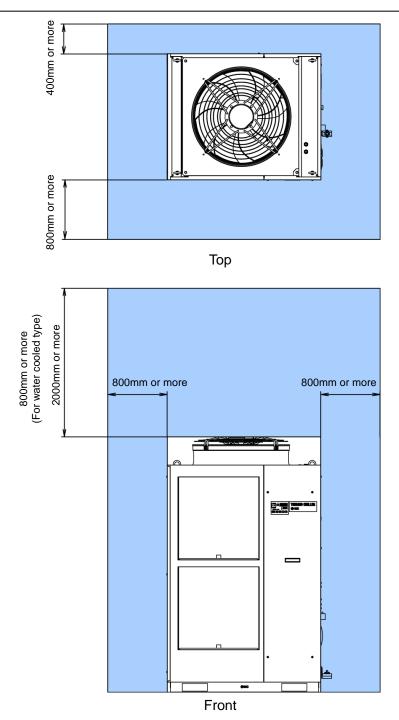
Installation space (This drawing shows "HRSH250-A-20".)
